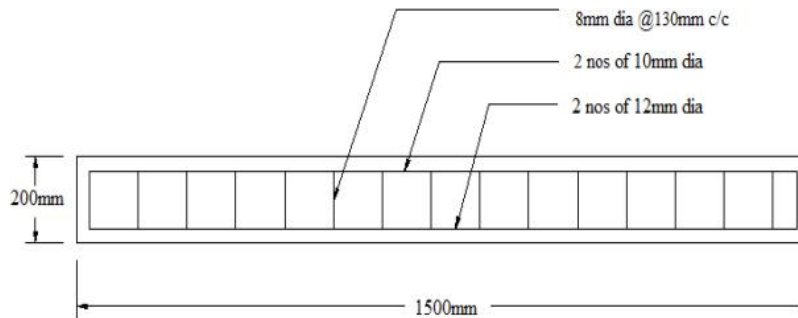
FIG II. LONGITUDINAL REINFORCEMENT OF BEAM
